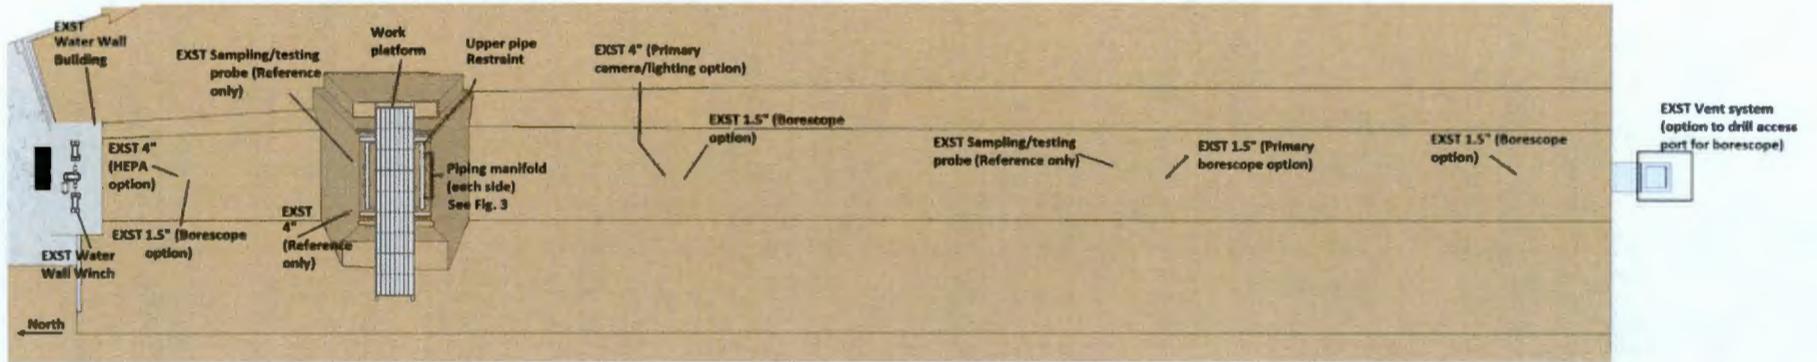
Plan View of Tunnel Number 1 with Equipment Placement and Layout
